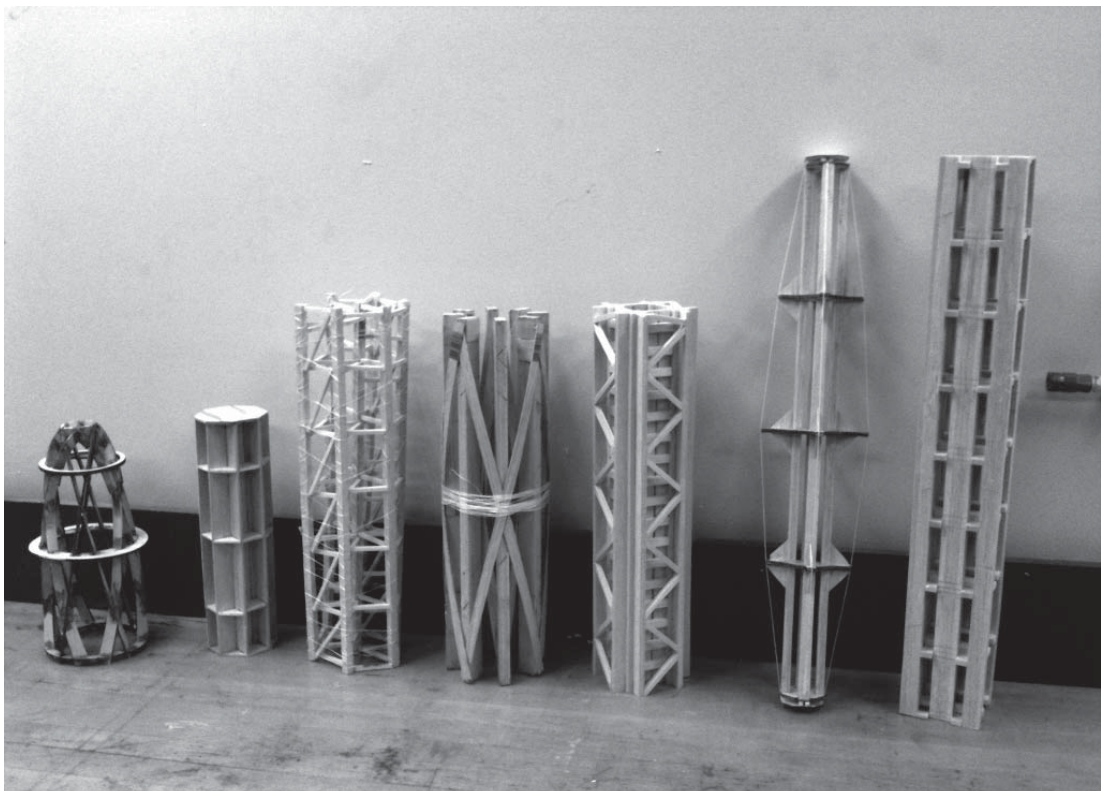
COLUMN DESIGN, BUILD, TEST AT MIT
